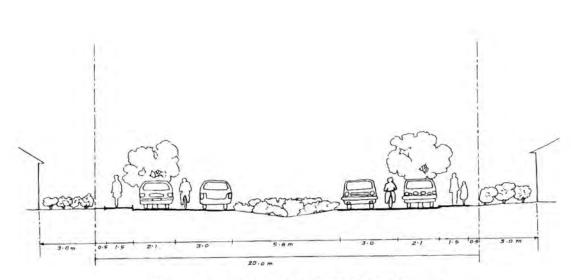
TYPICAL ROAD CROSS-SECTION
